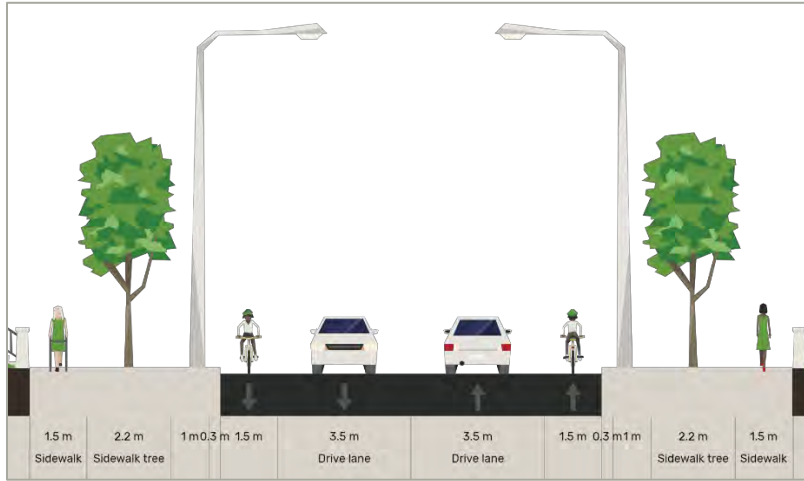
Typical Cross Section, 20m Collector Road, On-road Cycling Lanes
